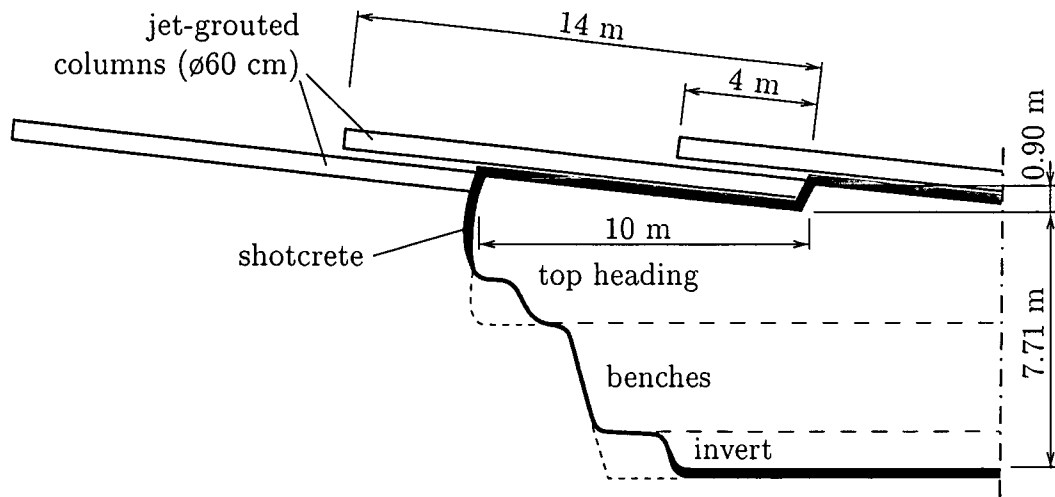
Numerical simulation of the tunnel excavation with HJG: longitudinal section
